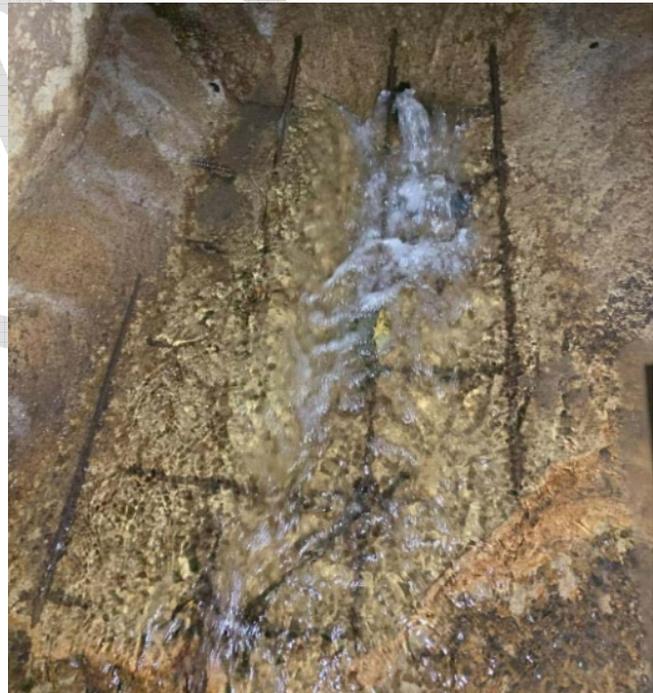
Exposed Reinforcement in Section No. 8 Invert Slab (ISI 2023)
